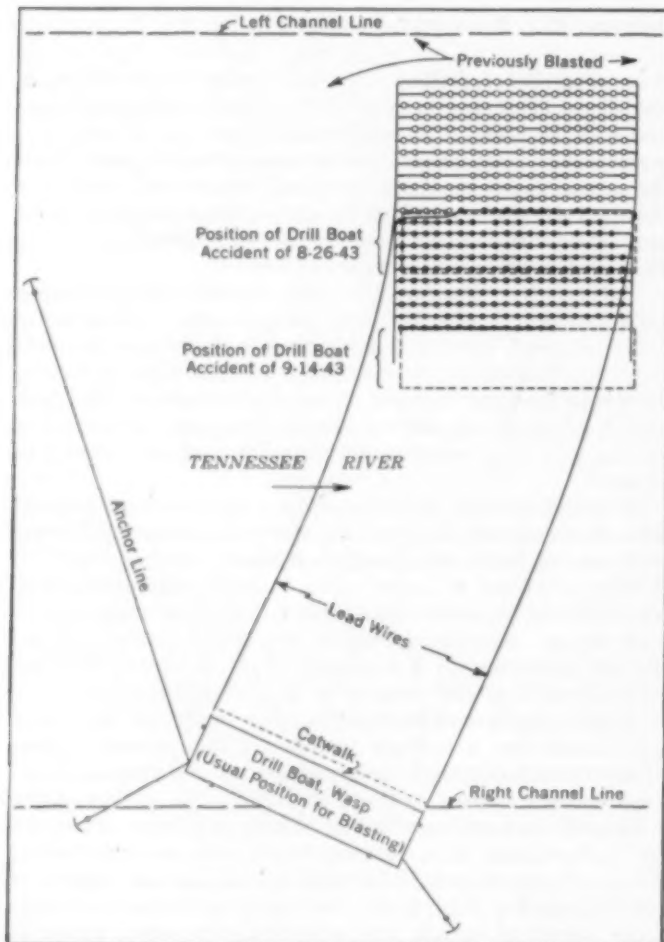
POSITIONS OF DRILLBOAT AND EXPLOSIVE FIELD ON THE TENNESSEE RIVER
